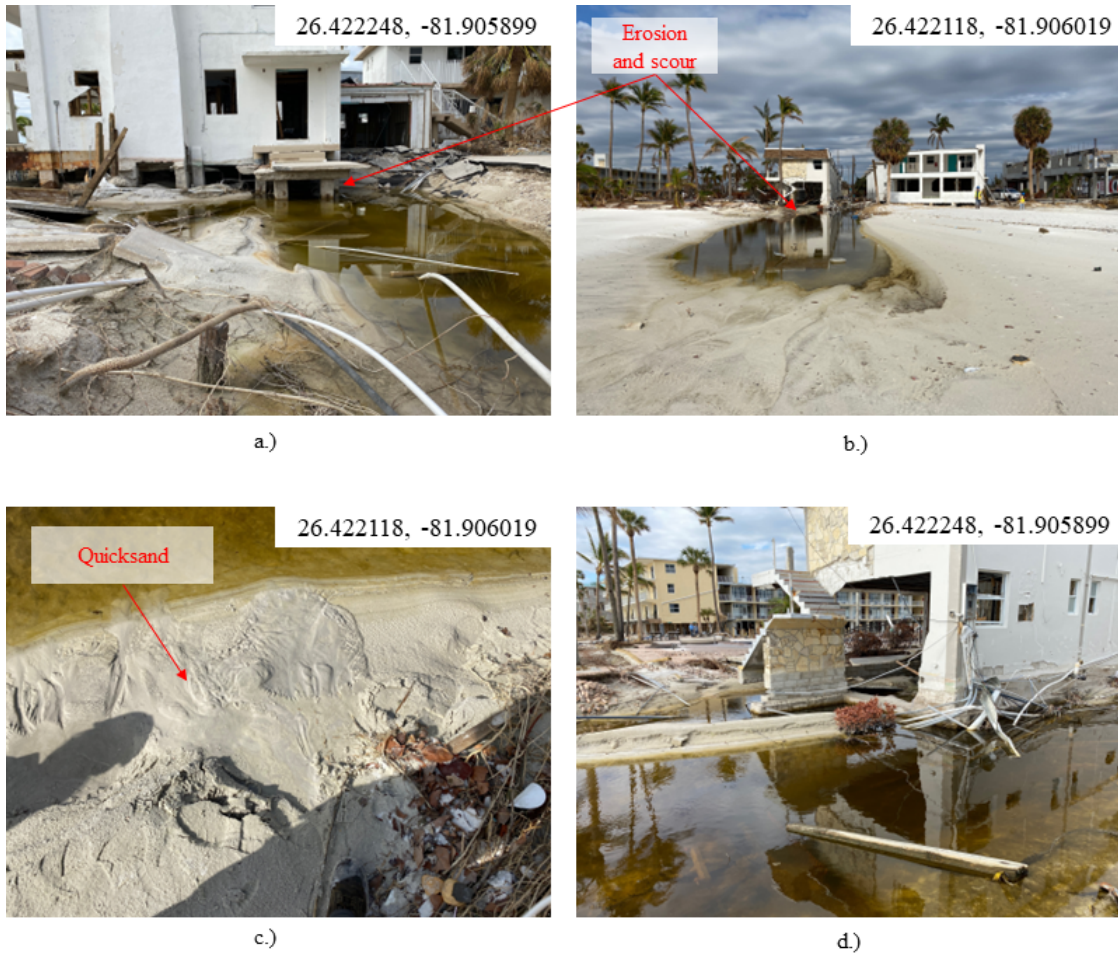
Ground images of failures observed in south east end of the Fort Myers Beach island, near Sunset Condominium: (a) erosion and scour underneath the buildings' foundation creating a ground depression filled with water and sediment transported by storm surge resembling a sinkhole; (b) path of water and sediment transported by storm surge depicting that the eroded areas were a result of a direct impact of the waves; (c) soil liquifaction or commonly known as quicksand was observed in the outer banks of the water path; (d) erosion and scour underneath the foundation of a house resulting in a ground depression engulfing the house and exposing the footings and foundation of the house
